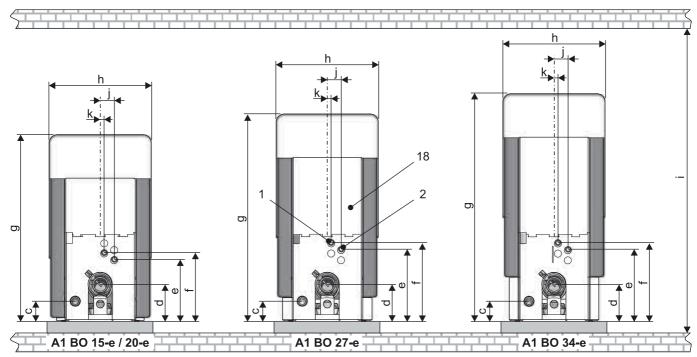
Dimensions and connection dimensions - view from the rear (for legend see tab. 4-1)
